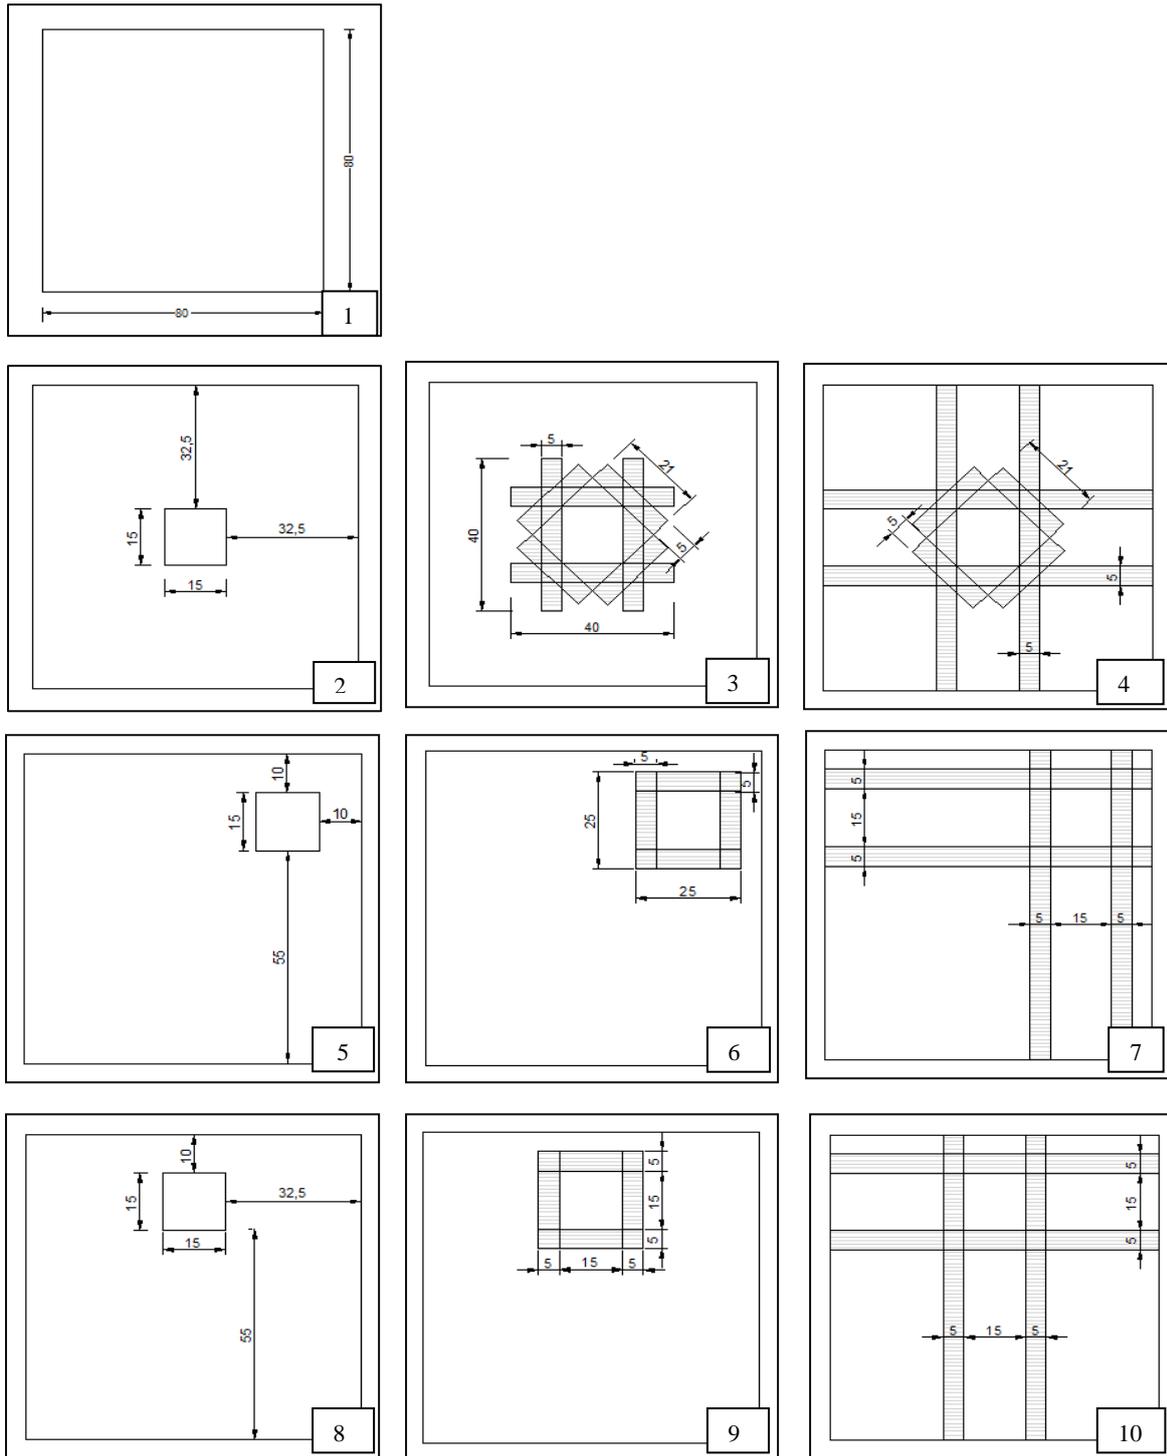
Details of tested specimens: (1) bottom view of slab (SC), (2) bottom view of slab (S1), (3) bottom view of slab (S1.1) first scheme, (4) bottom view of slab (S1.2) second scheme, (5) bottom view of slab (S2), (6) bottom view of slab (S2.1) third scheme, (7) bottom view of slab (S2.2) fourth scheme, (8) bottom view of slab (S3), (9) bottom view of slab (S3.1) third scheme, (10) bottom view of slab (S3.2) fourth scheme.
